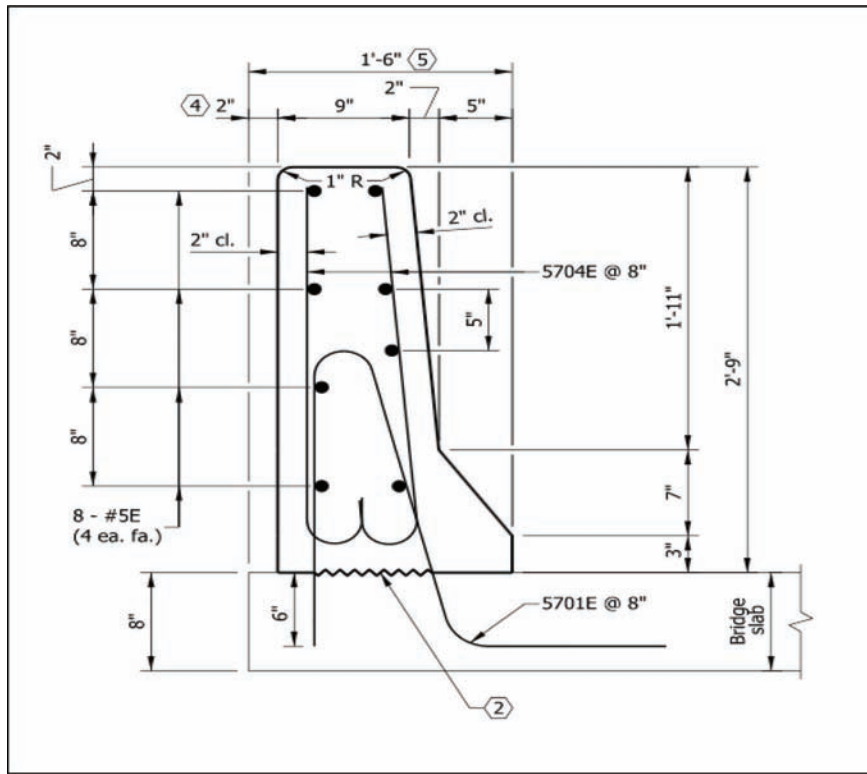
Type FC bridge railing detail (INDOT, 2015).
